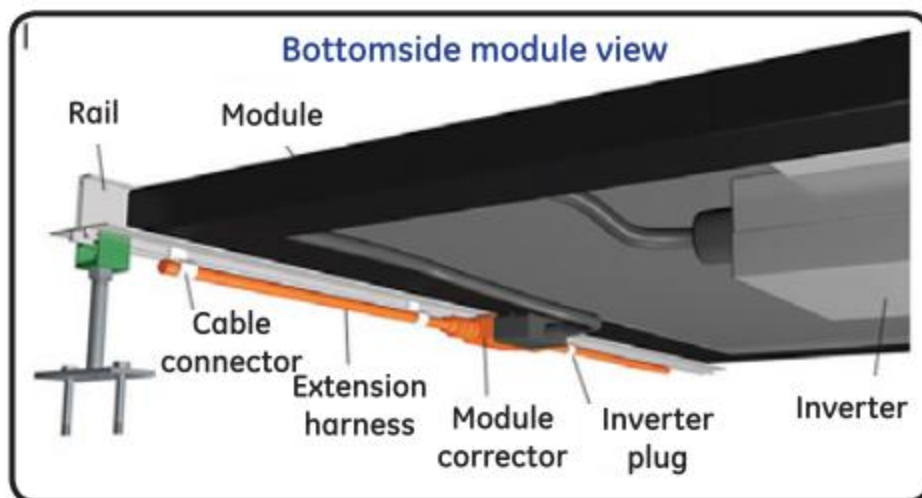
Bottom view of insert and capture/plug-and-play solar electric assembly
